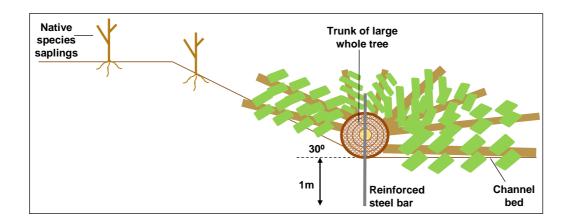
Cross-sectional view of large tree placement secured using wire lacing attached to wooden stakes or reinforced steel bar driven into the channel bed
